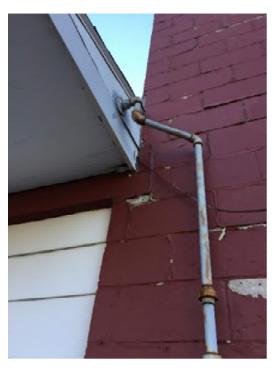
Paint peeling off chimney on east side of building. Cracking throughout mortar joints. Walls should be structurally analyzed to confirm integrity. If sound, remove finish, tuckpoint, and repaint.(Priority 0).
